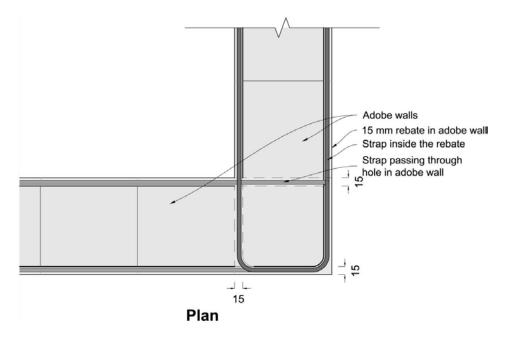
Plan view showing how interior lengths of strap pass through a wall and then wrap around and pass back along the wall, tying the two walls together.
